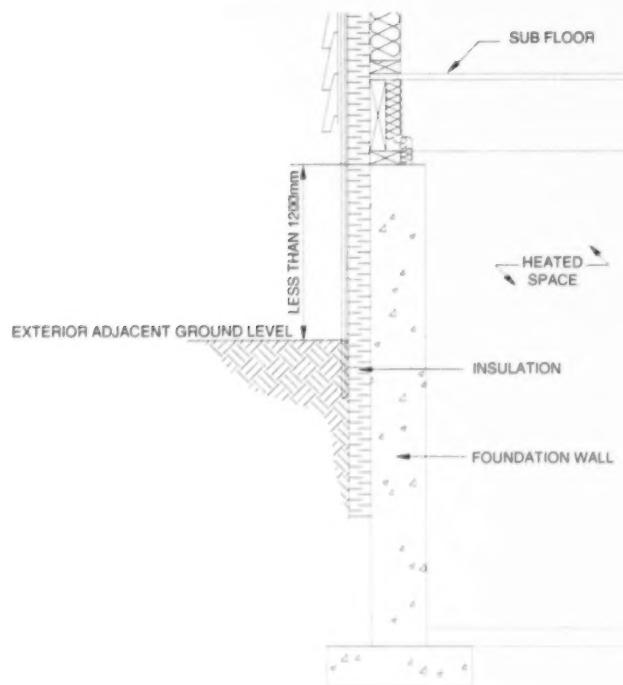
1 Foundation Wall that can have RSI corresponding to that of a Below-Grade Wall
